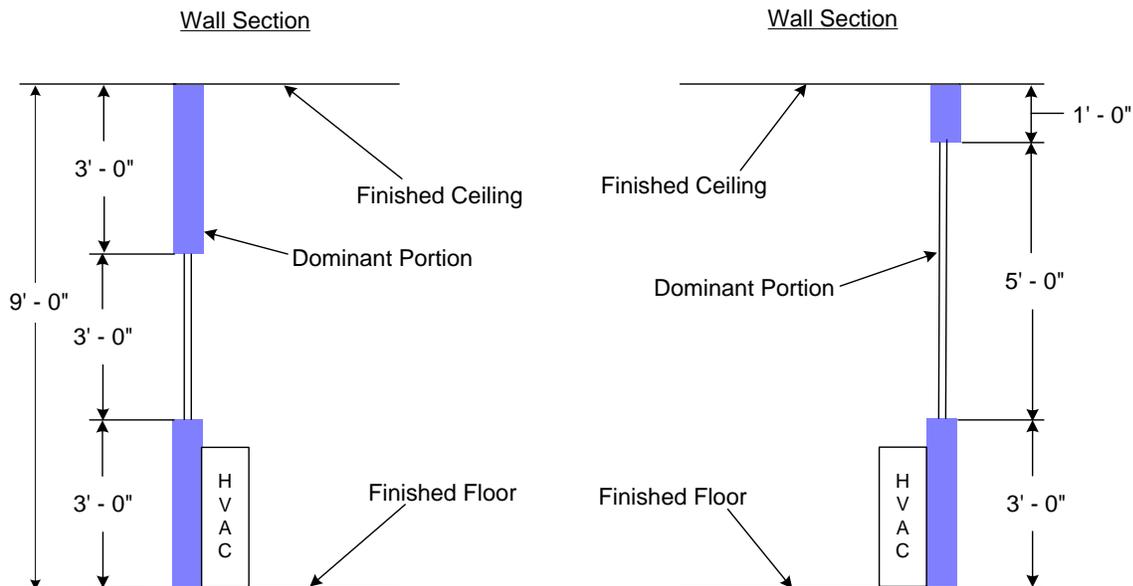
If no finished surface of the permanent, outer building wall is 50% or more of the vertical floor-to-ceiling dimension (as shown in the left diagram), or if the permanent, outer building wall is not vertical, the Dominant Portion is the inside, finished surface of the wall where the wall intersects the finished floor (as shown in the right diagram).
